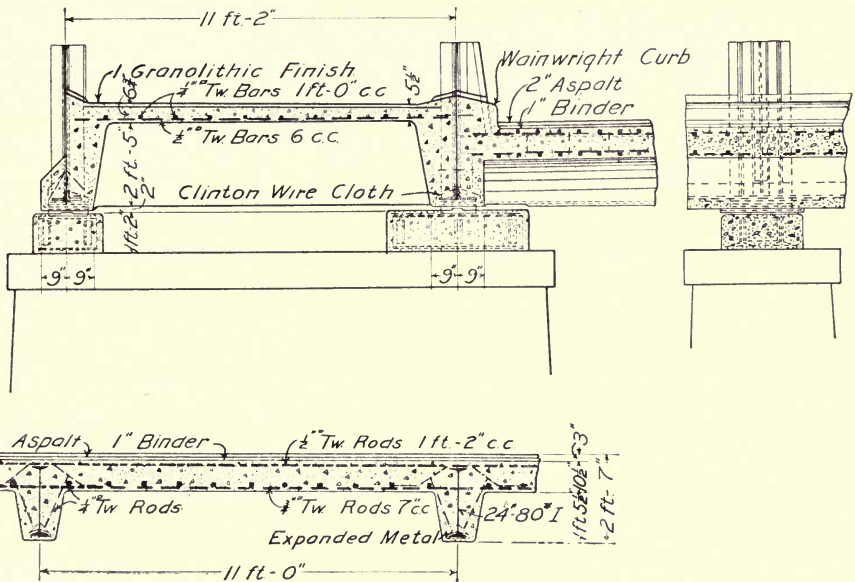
DETAILS OF FLOOR CONSTRUCTION, FIRST AVENUE VIADUCT.
